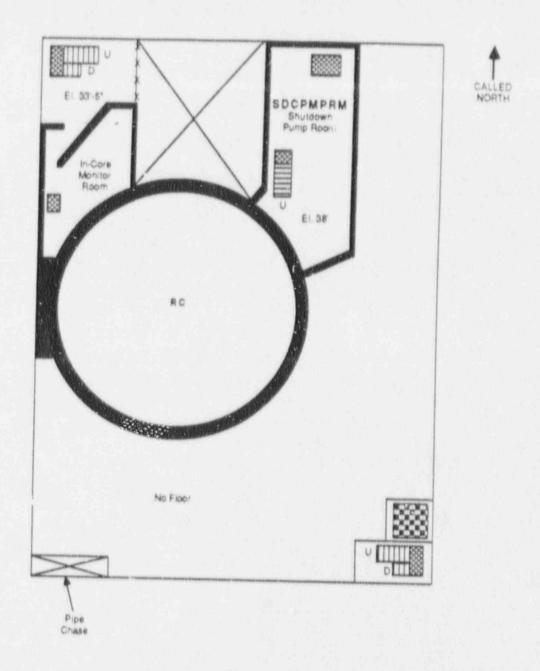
Oyster Creek Reactor Building - Elevations 33'-5" to 38'-0"
